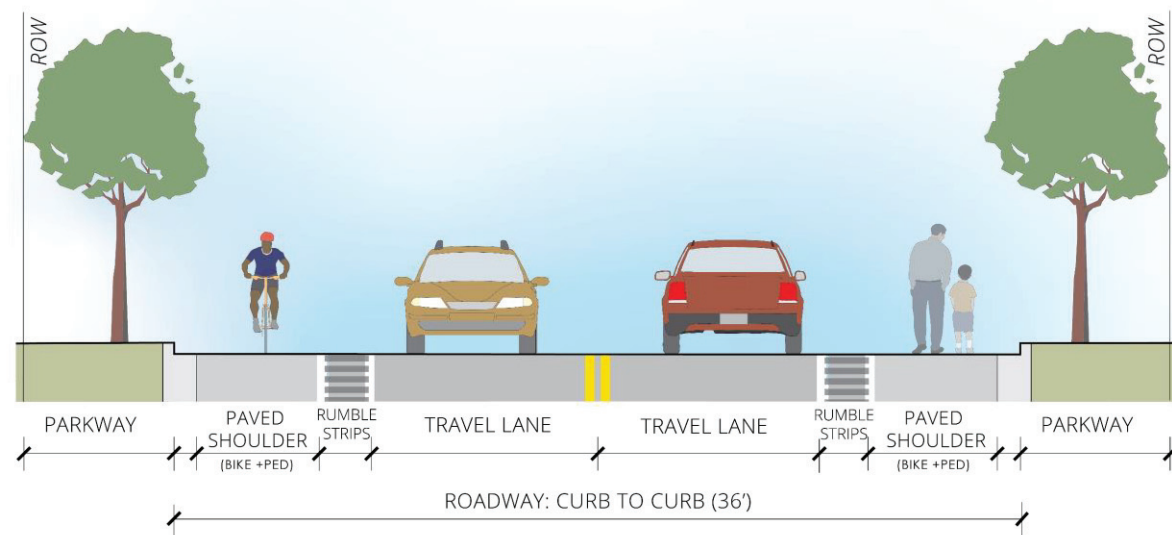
RURAL LOCAL ROAD SECTION VIEW (OPTION C2)
